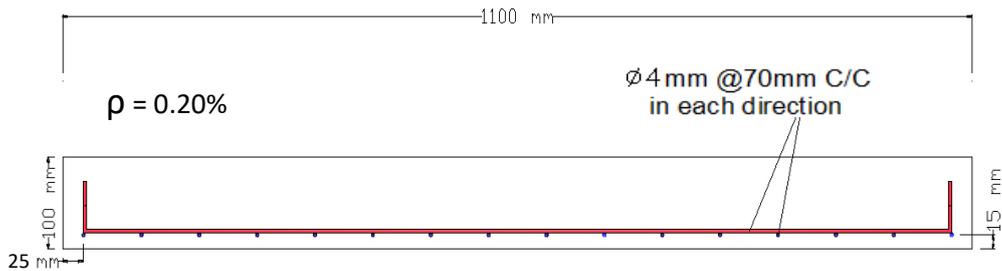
Main Reinforcement details for slabs of steel ratio (0.20%).
